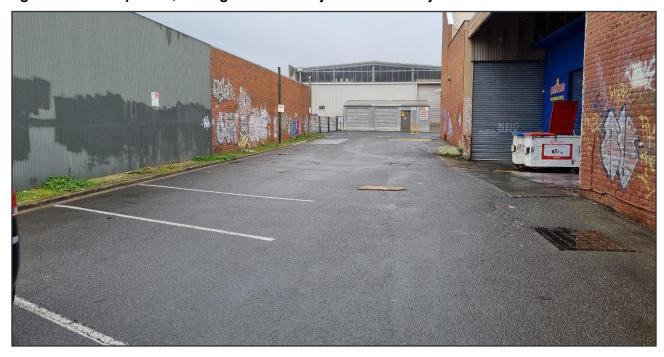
Bradbys Lane, looking south from adjacent to the subject site
